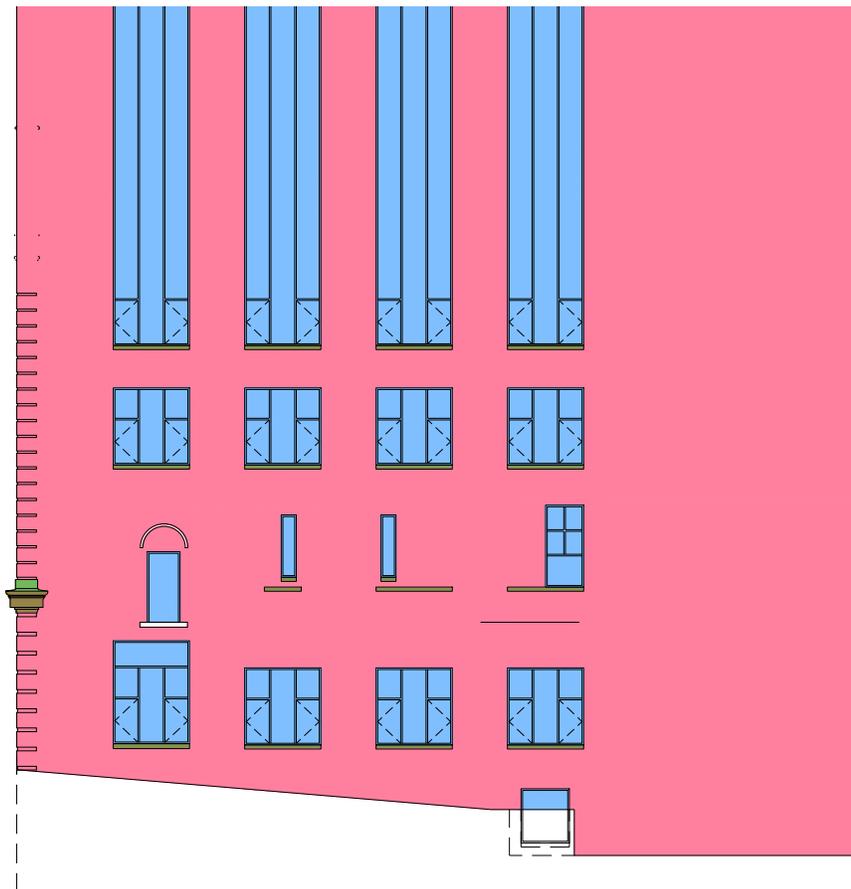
(4): North Courtyard: West-Facing Wall
